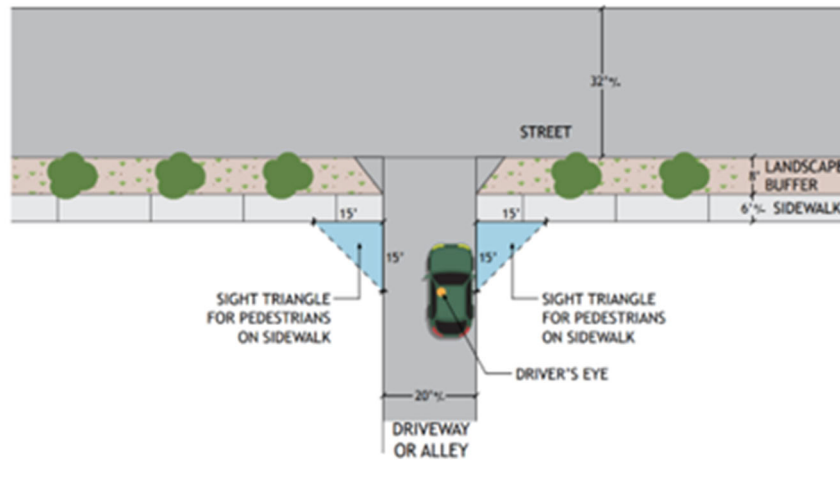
Sight Triangle Area at the intersection of a Driveway or Alley and a Street with a sidewalk.
